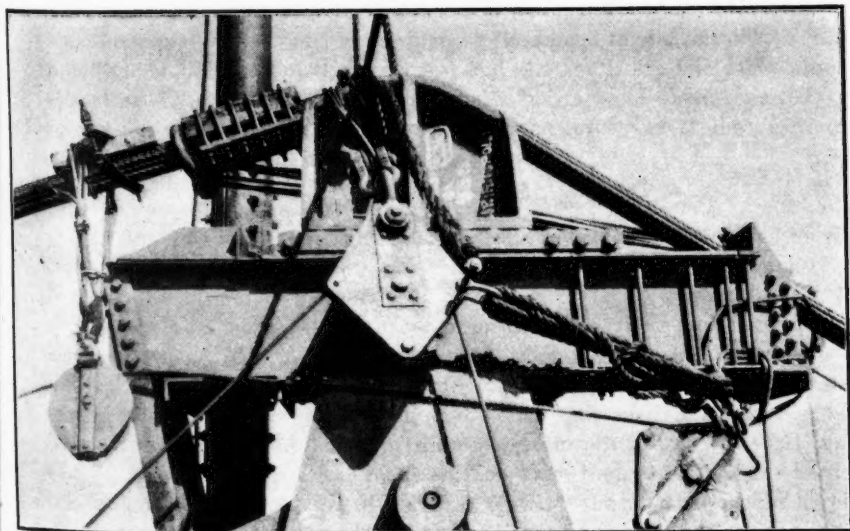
ROPE SHOE OVER CENTER OF COLUMN, ROPE CARRYING ALL THE EYE-BARS, FLORIANOPOLIS BRIDGE.
